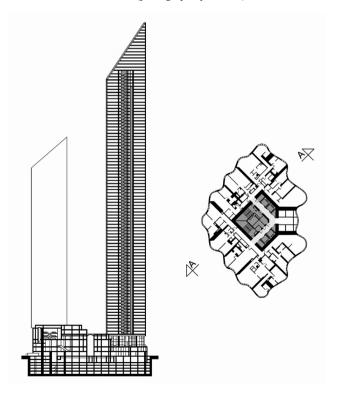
Burj Mohammed Bin Rashid Tower: plan and section (developed by authors based on [51])
